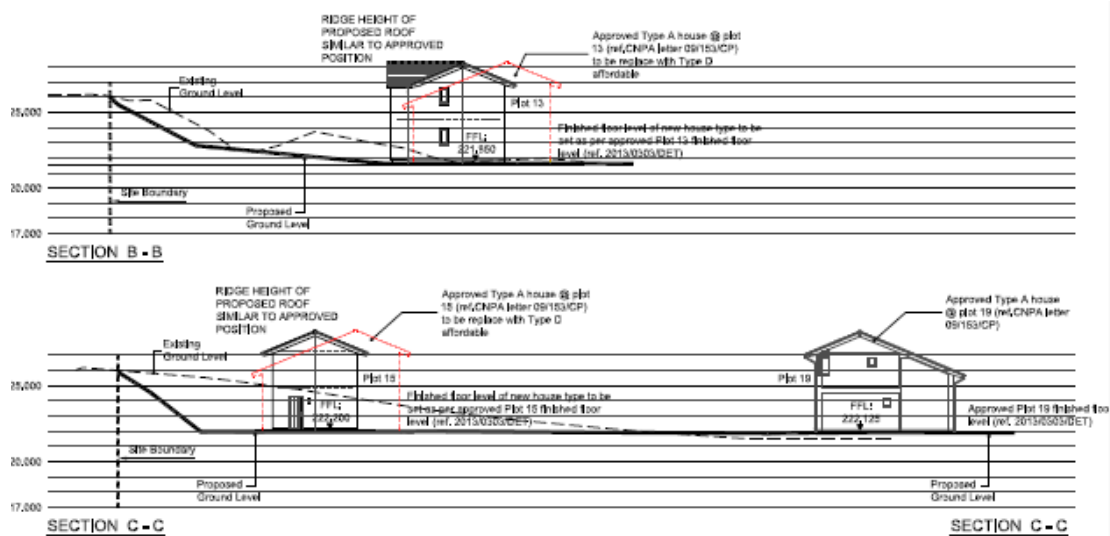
(b): Proposed site sections from south (Extract from Applicant's drawing 3918/02/030 Revision C for information only)
